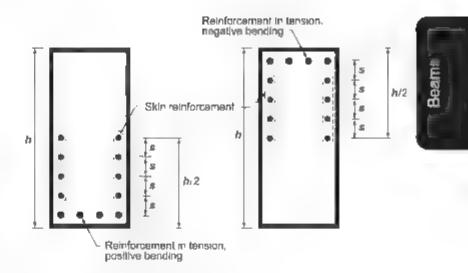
Skin reinforcement for beams and joists with h > 36 in. (Code Section R9.7.2.3)
